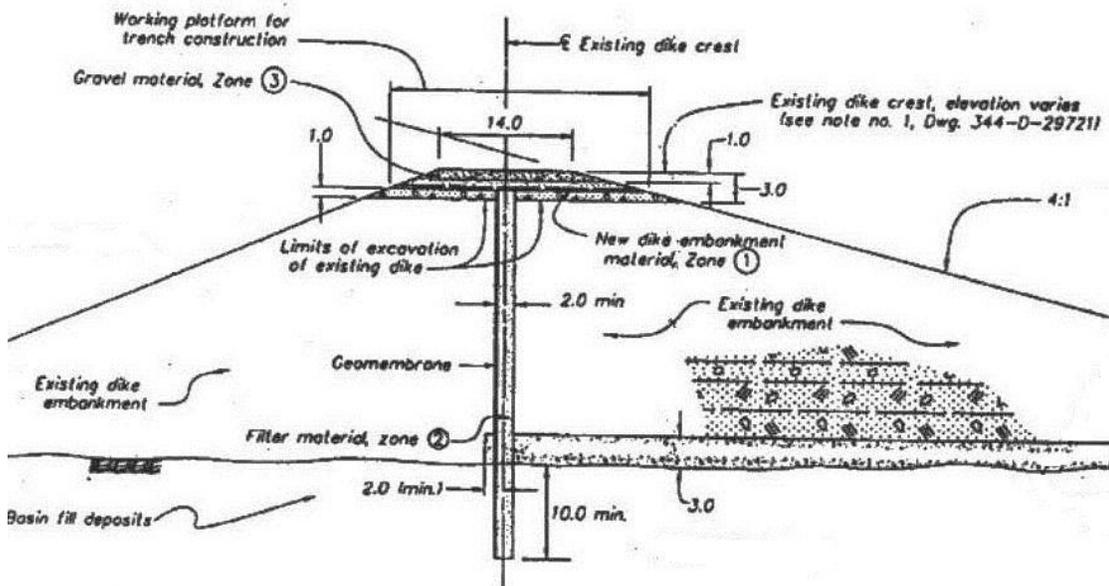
Reach 11 Dikes geomembrane cutoff wall design.
